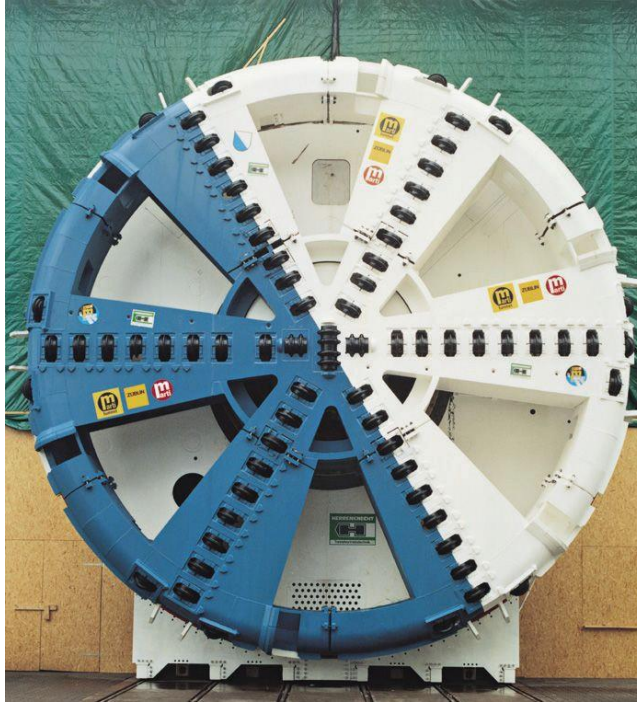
above shows the cutterhead of the Herrenknecht S-256 Single Shield TBM used in the construction of the Isisberg tunnel, Switzerland, which on completion will be the longest underground section of the western Zurich bypass, will be directing transit traffic to central Switzerland around the city. The diameter of the cutterhead is about 38' (11.8 m). See Table D-1 for more data about the machine (Herrenknecht).
